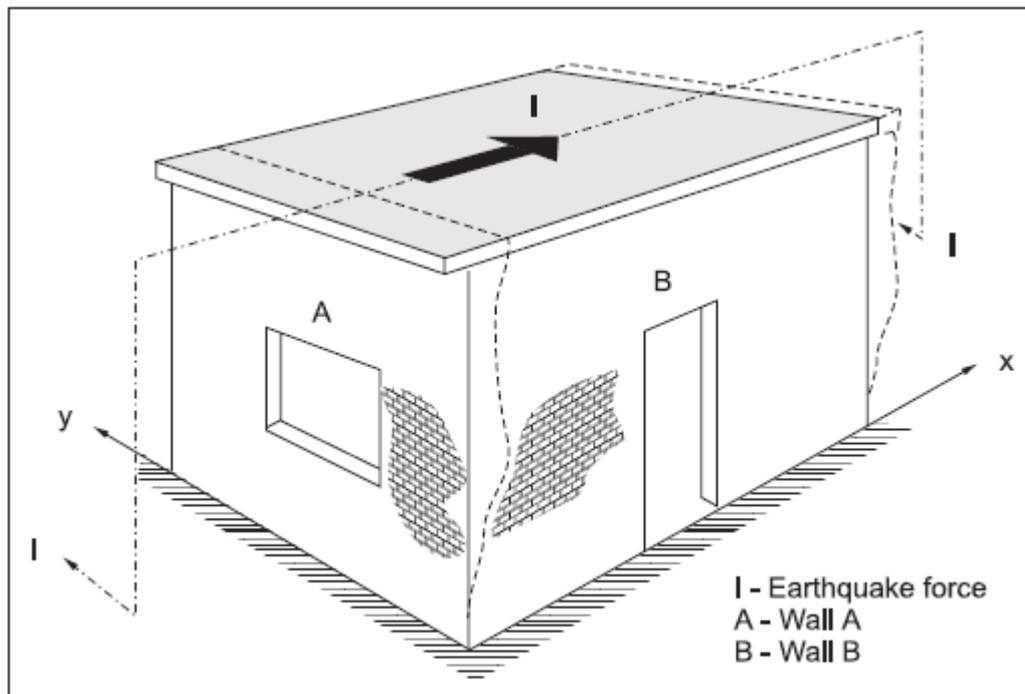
21 Roof and wall enclosure (IAEE, 2004)
